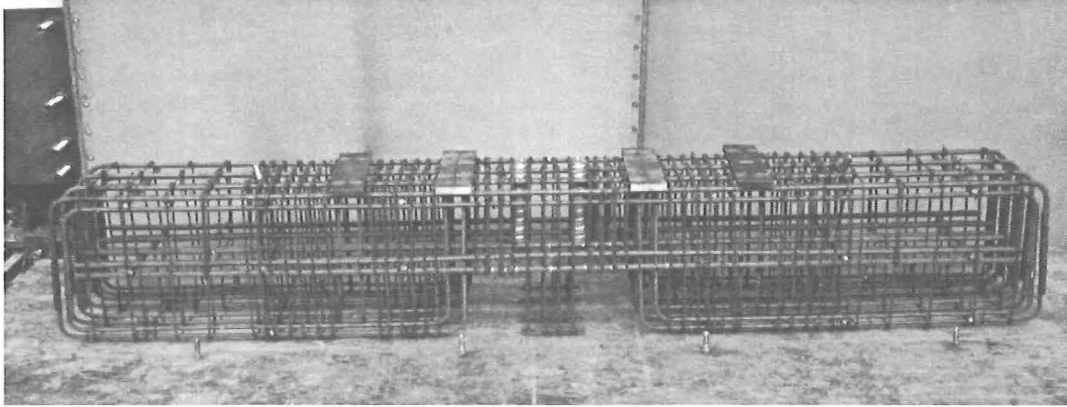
Reinforcing cage for the foundation beam of Unit 2.
